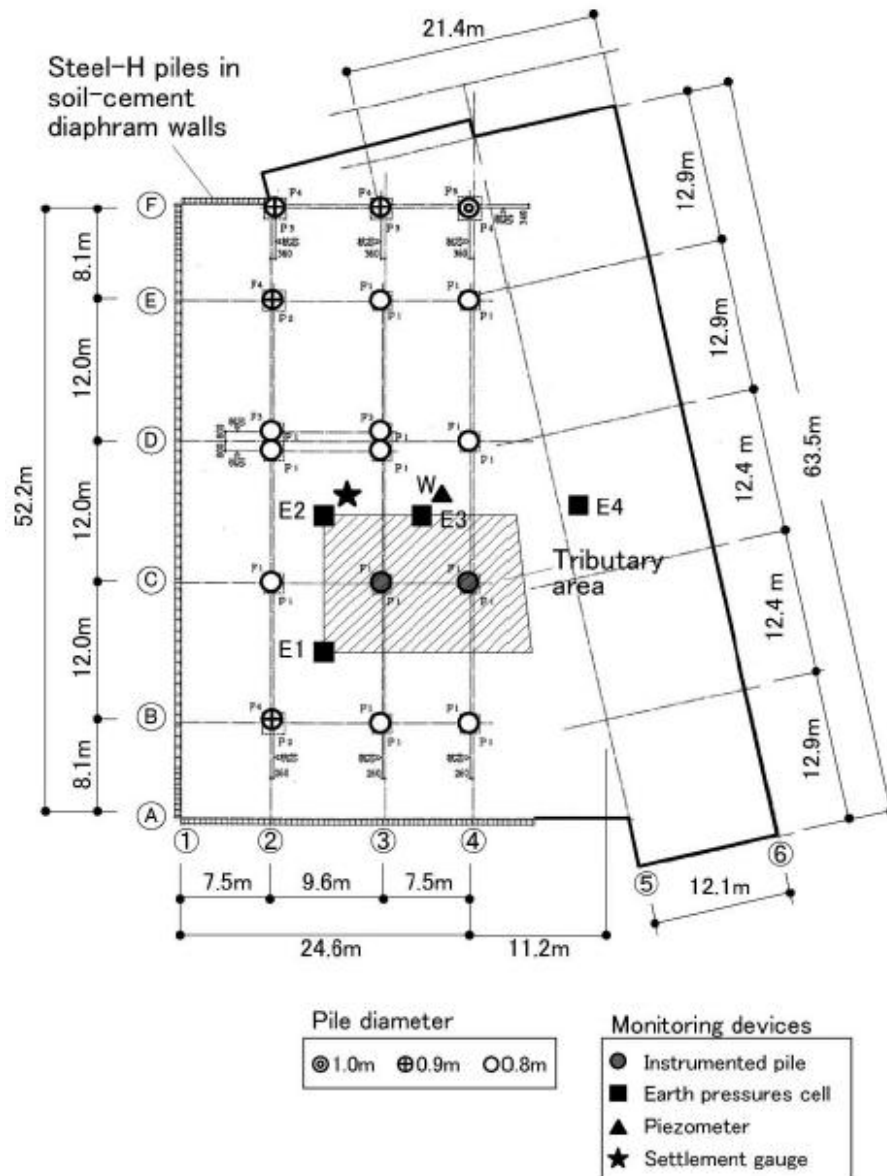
Pile arrangement (Yamashita et al. 2011)
